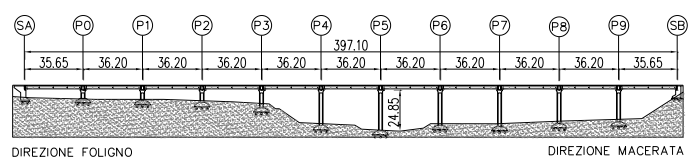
Longitudinal view of the viaduct / Prospetto longitudinale del viadotto.
